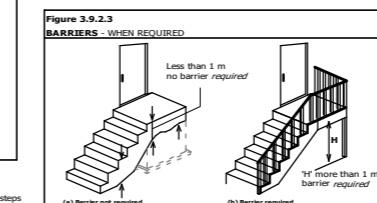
BARRIERS - WHEN REQUIRED
